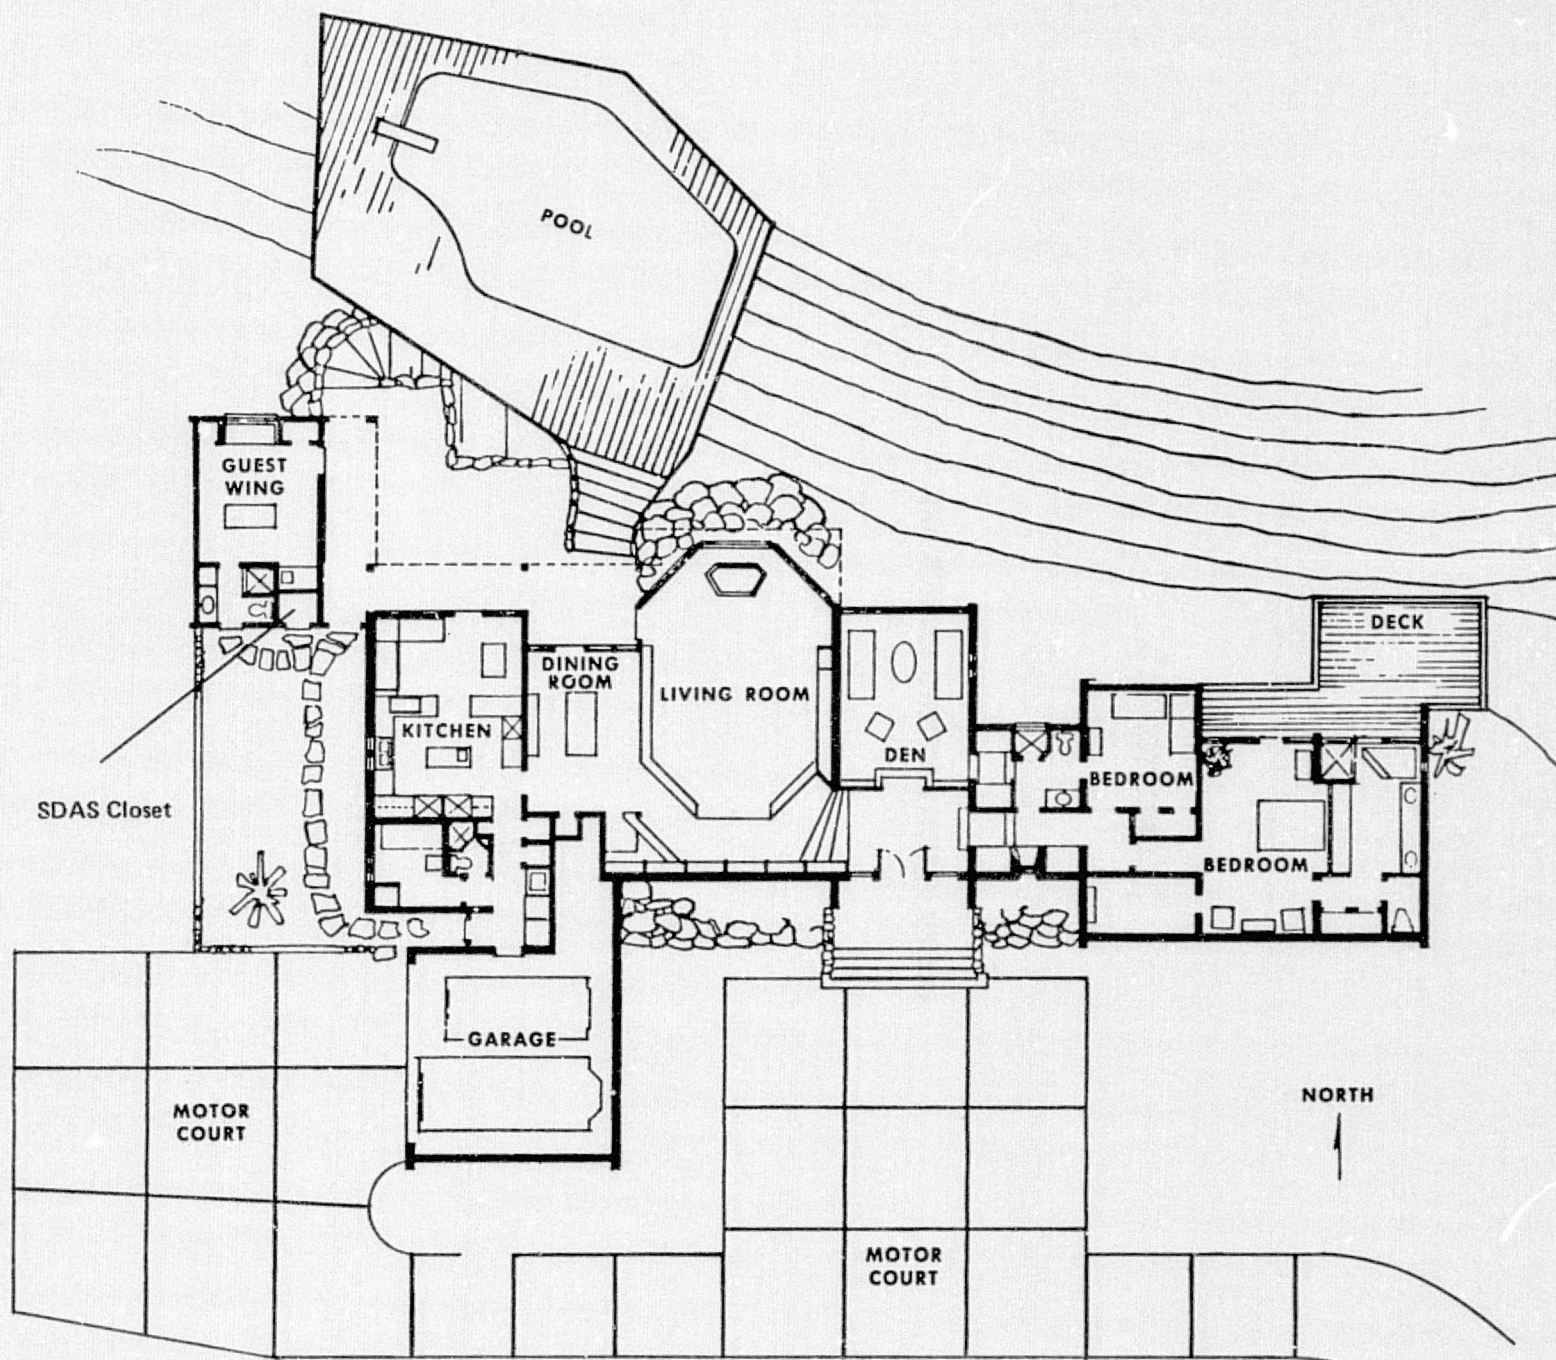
DECADE 80 SOLAR HOUSE FLOOR PLAN SHOWING
